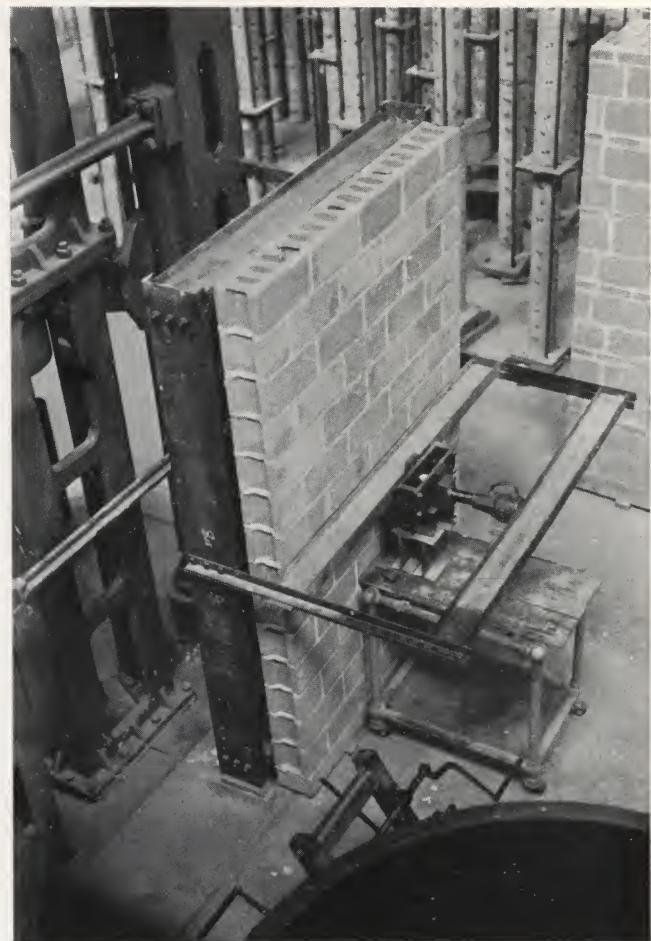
Concrete masonry wall being tested for flexural strength, University of Illinois. Wall is supported against steel frame, transverse load being applied at mid-point with screw-jack on steel I-beam. Dynamometer between jack and beam records load.
